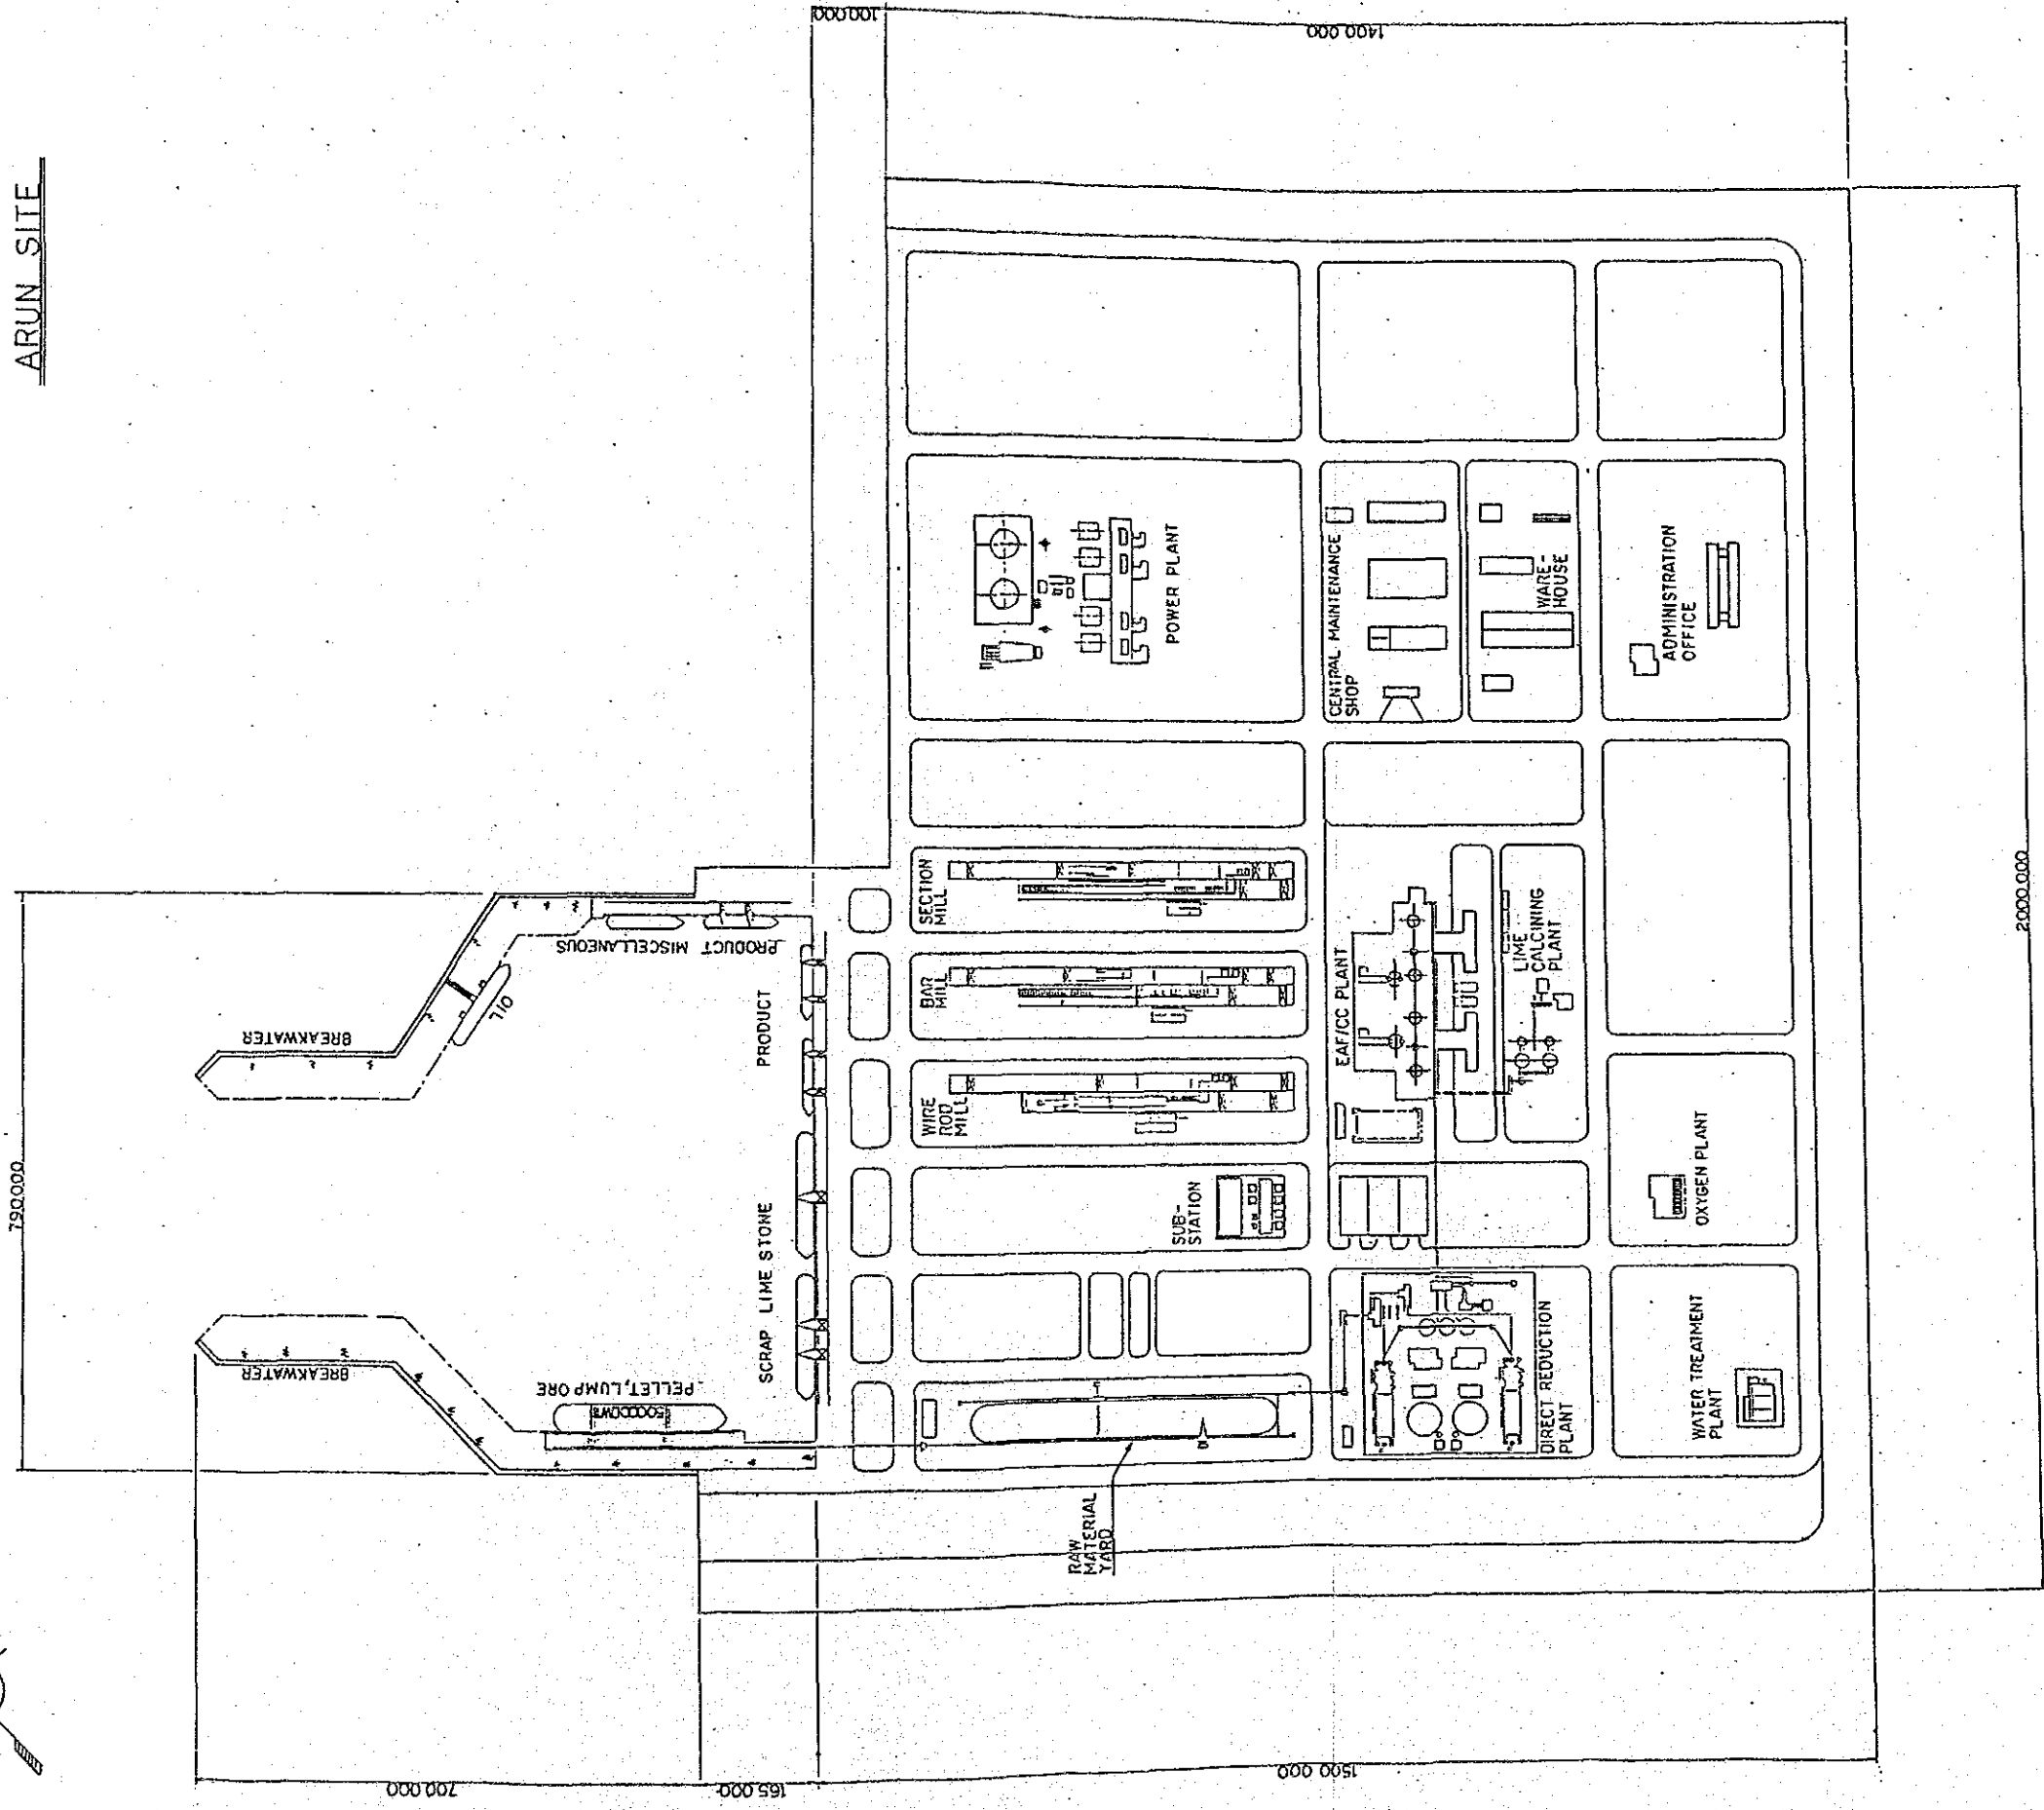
GENERAL LAYOUT (ARUN)
